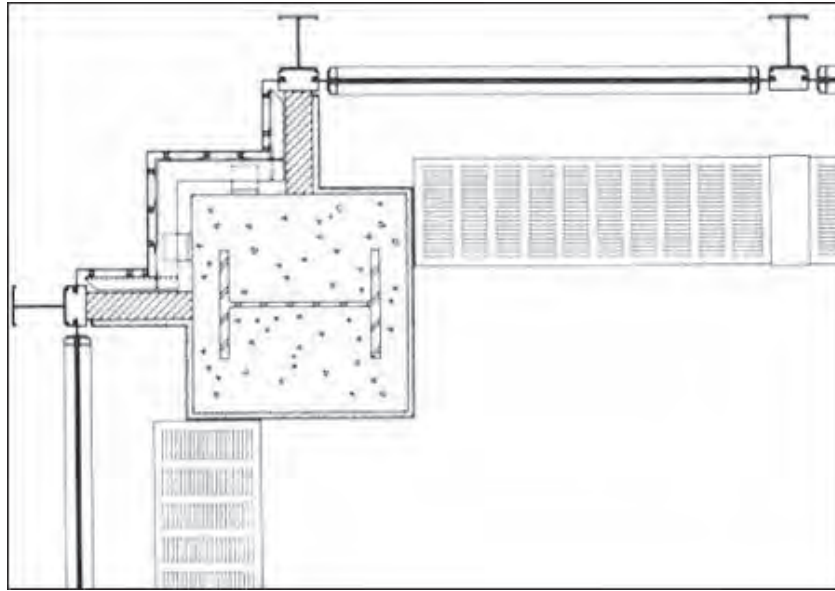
Mies van der Rohe, Seagram Building-corner section, New York, 1958
